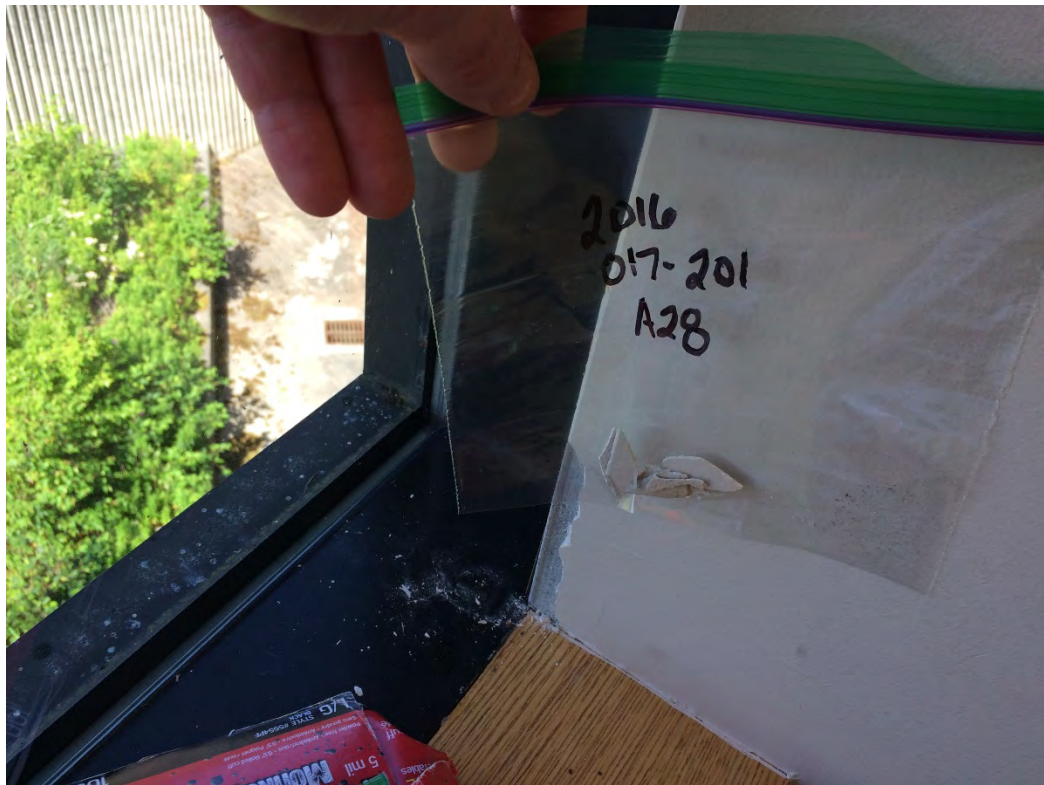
Asbestos sample A28, drywall joint compound collected from wall in O17-201. No asbestos detected.
